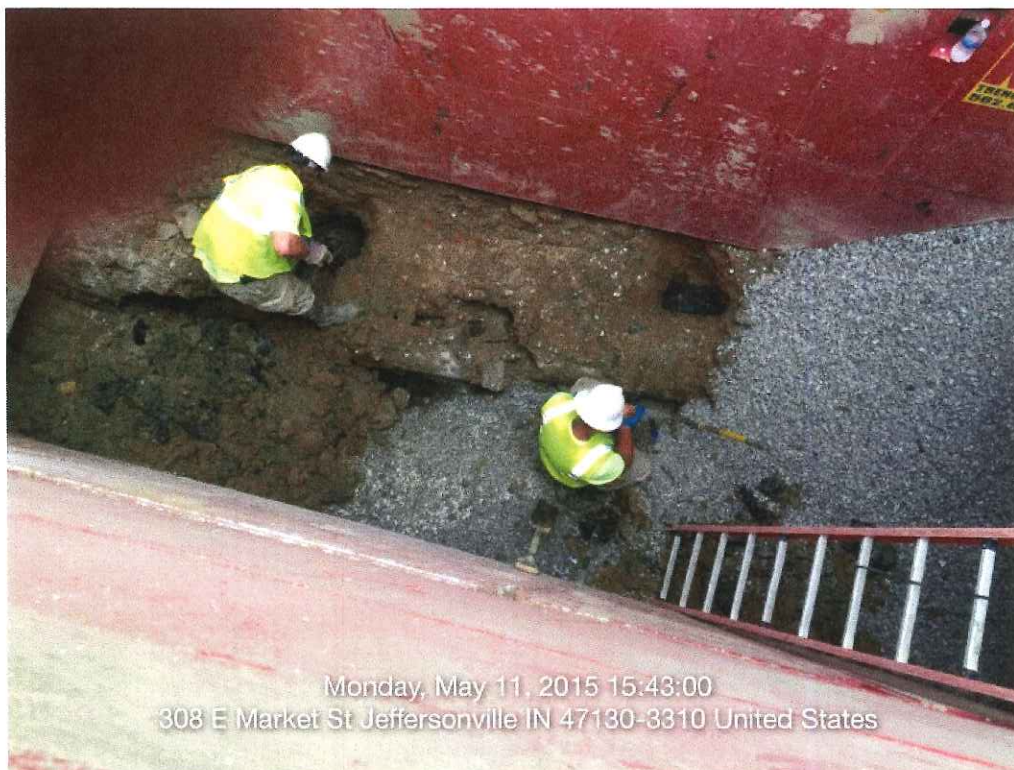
Department Staff preparing the VCP sewer for connection to the new PVC sewer
